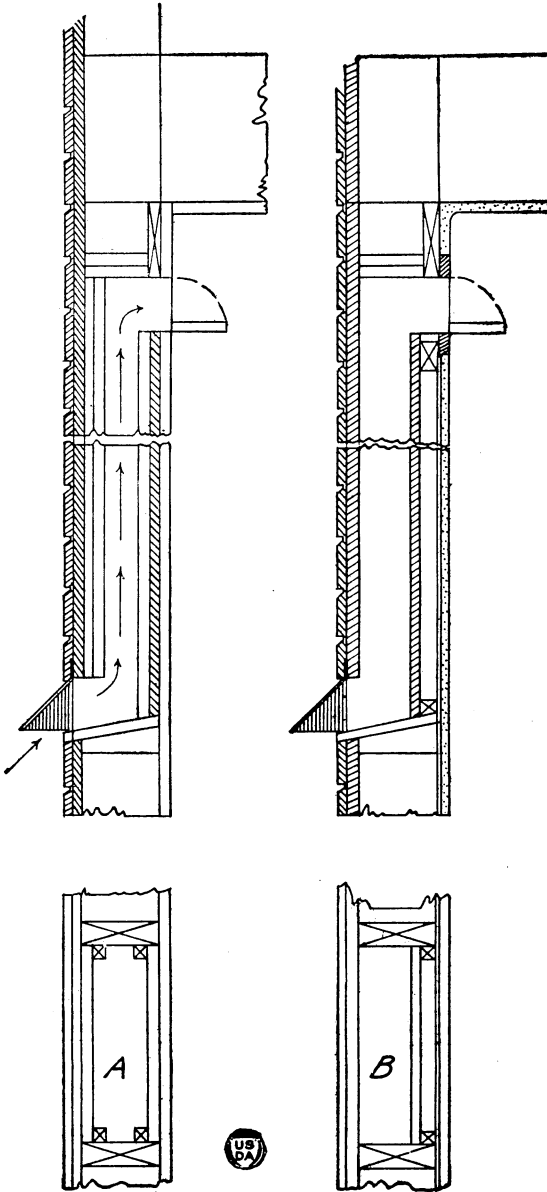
Details of inlet-flue construction: *A*, for barn with wood sheathing on inside walls; *B*, for barn with plastered inside walls.
